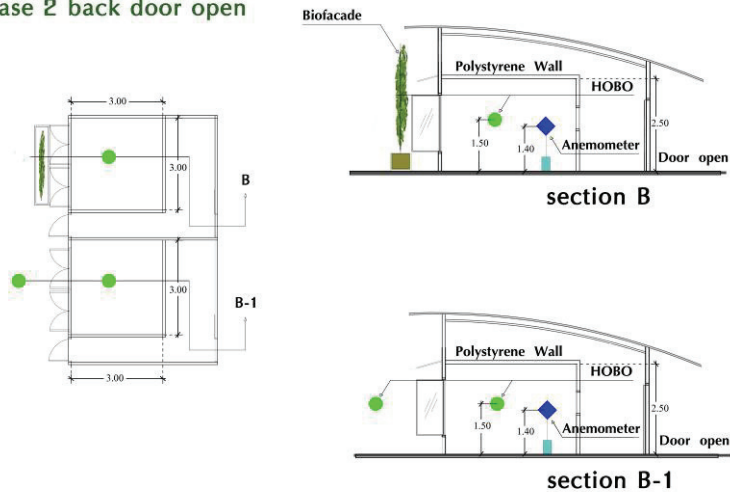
Case C2 is assumed to be natural ventilation by open back door of the test rooms
